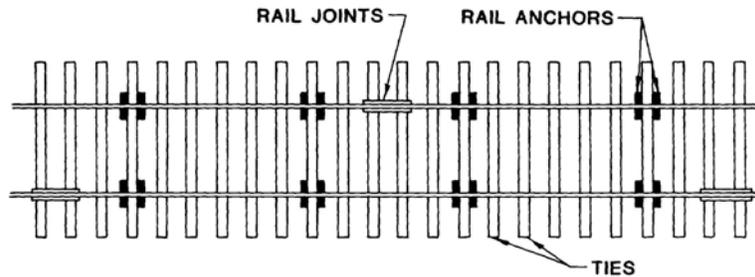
Recommended Minimum Anchoring Pattern for 39-foot Rails.
